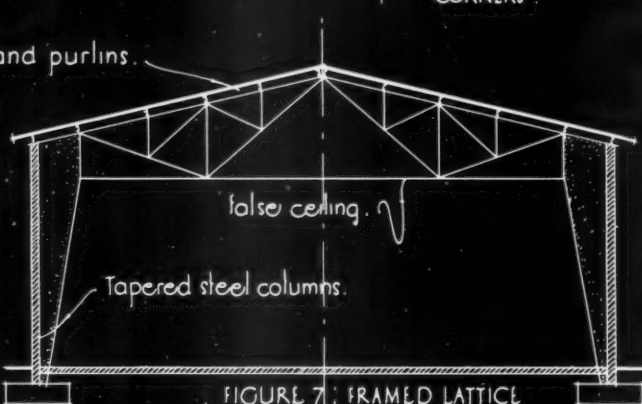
FRAMED LATTICE GIRDER CONSTRUCTION.
